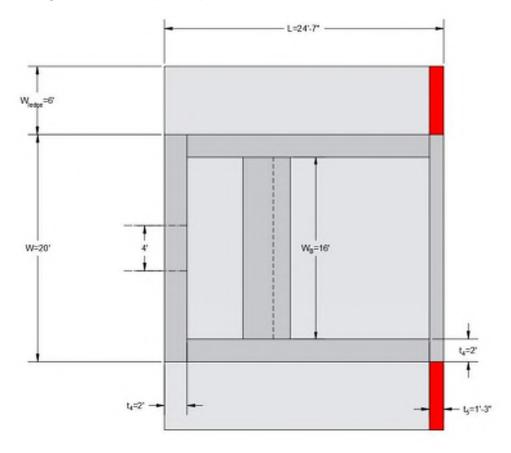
Impact Basin Plan View and Wingwalls (In Red)
